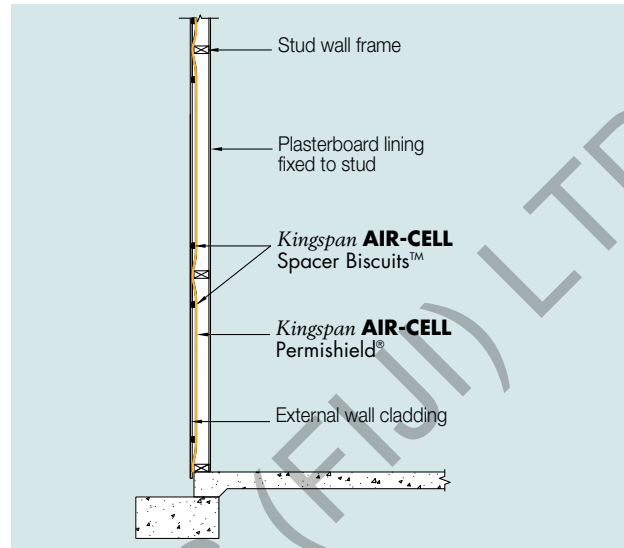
Side elevation of Kingspan AIR-CELL Permishield® on steel-framed wall
